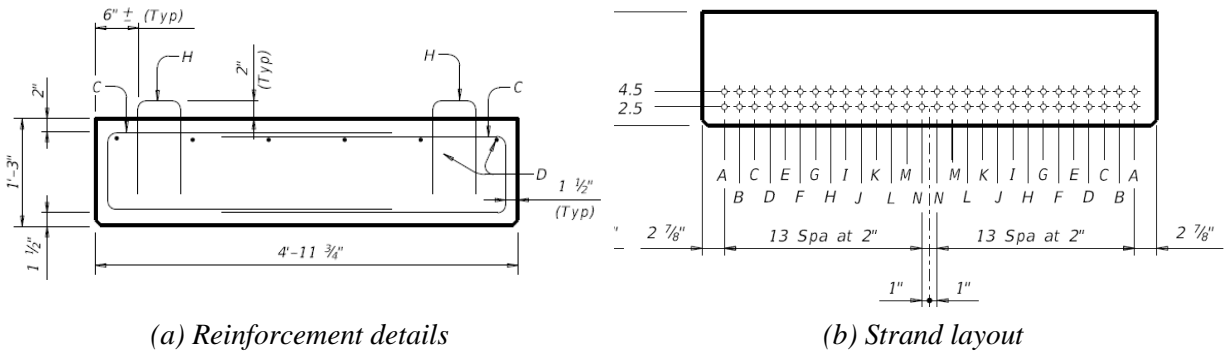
Section Geometry of 5SB15 Slab Beam.
